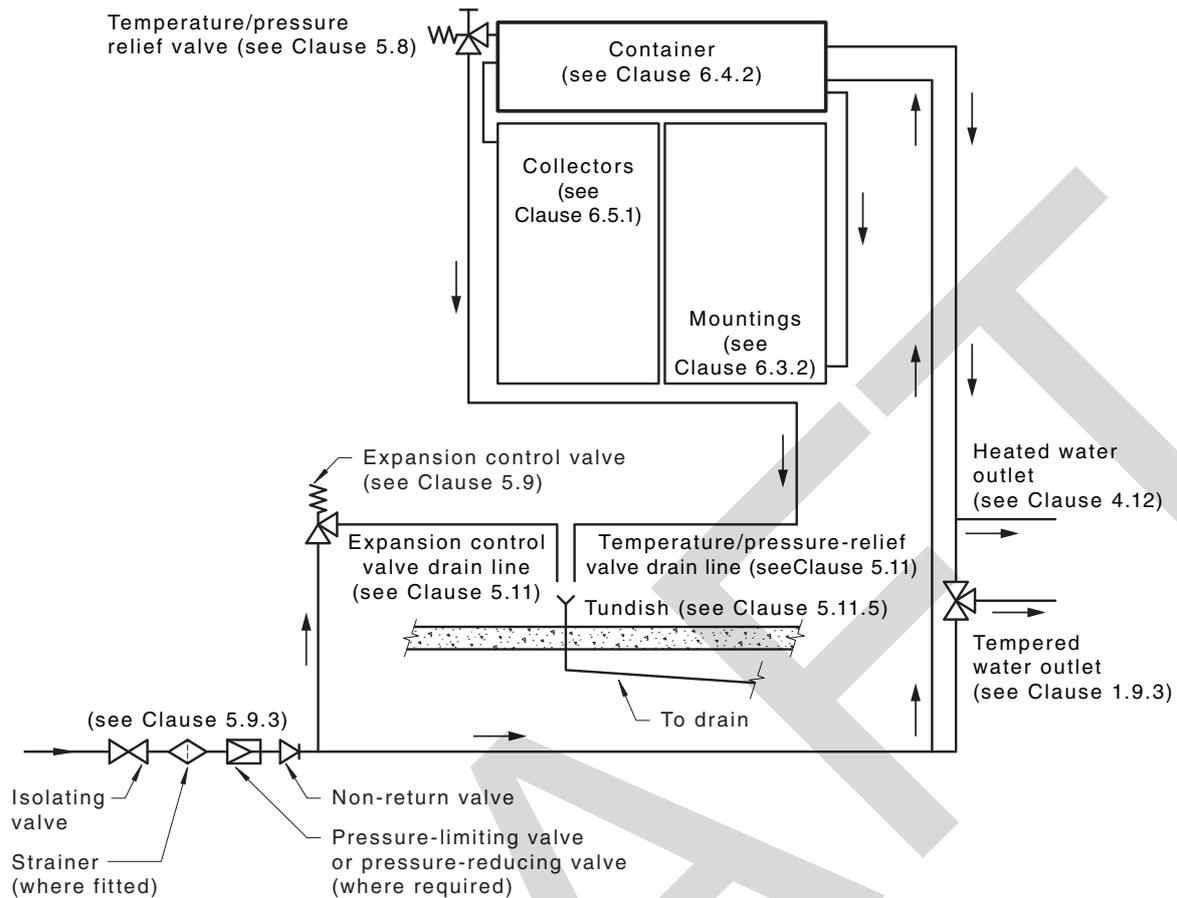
TYPICAL INSTALLATION OF CLOSE-COUPLED SOLAR WATER HEATER
